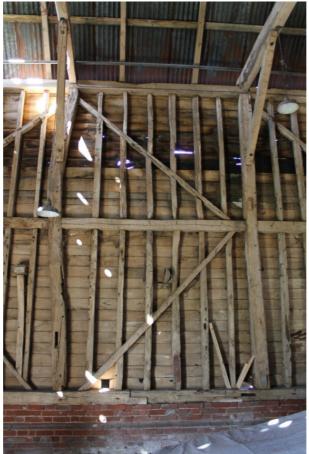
Framing of bay 6, showing the primary bracing forming a diamond pattern - view north-west
